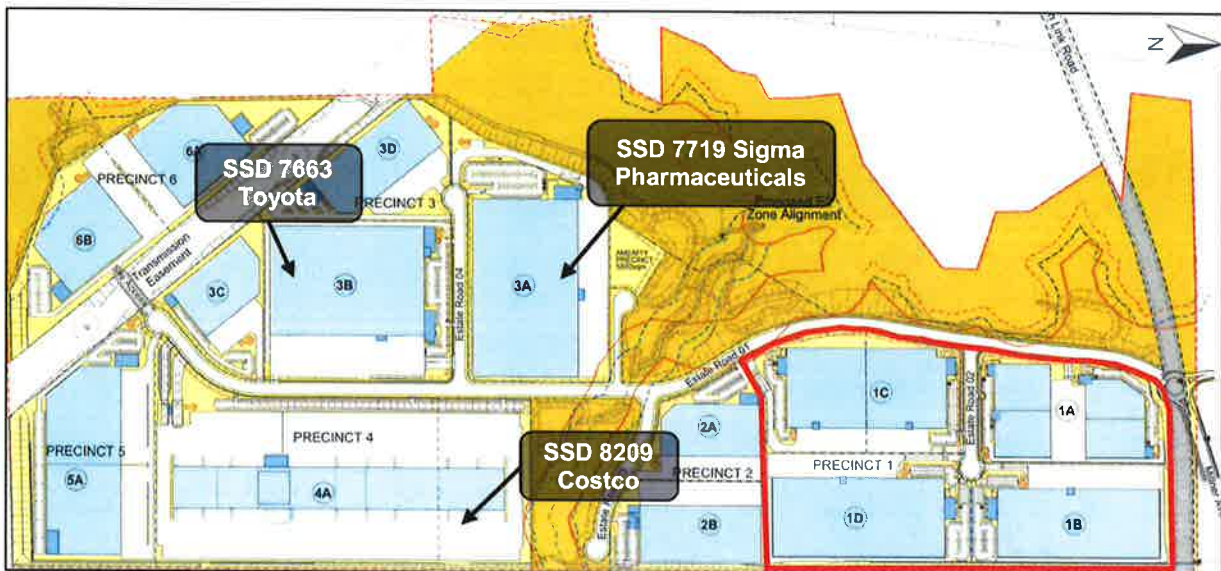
Approved Site Plan (MOD 1) including the locations of site specific Development Applications
